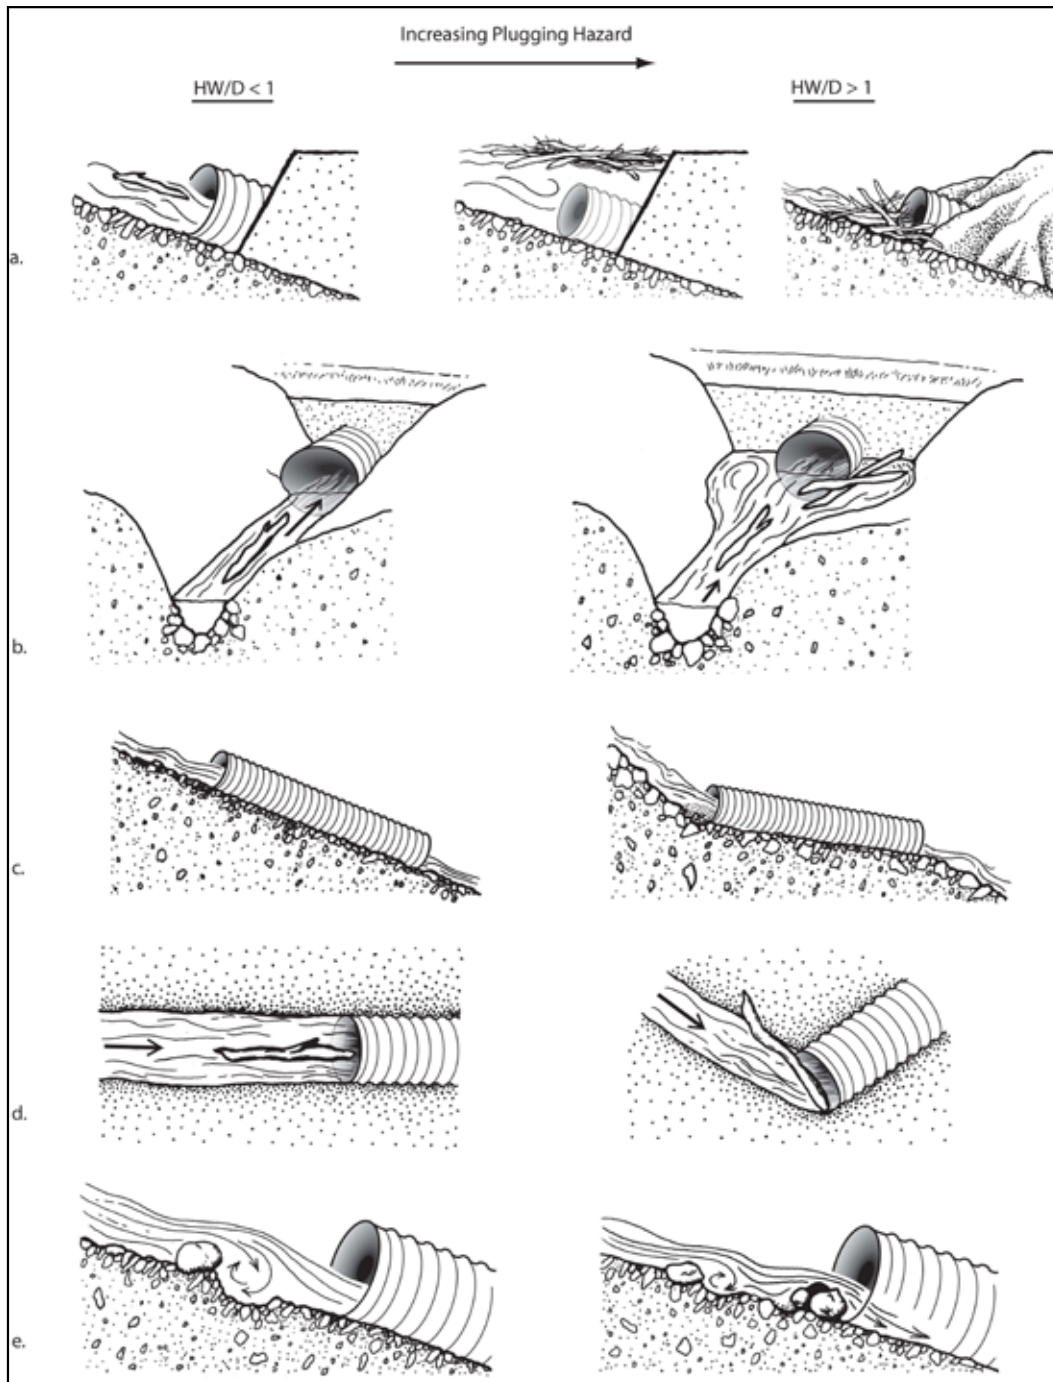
Common plugging hazard problems found with culverts (Furniss et al. 1998).
